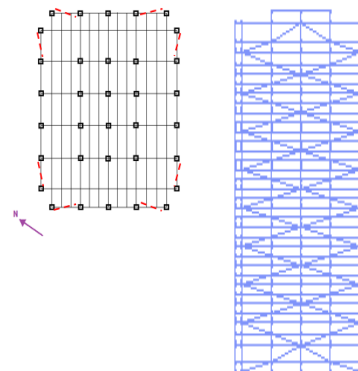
Plan view and exterior elevations of case study building showing trial placement of dampers
